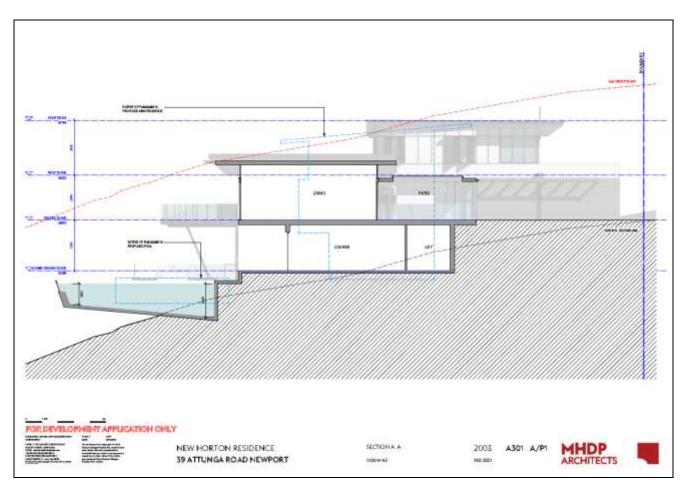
Illustrates the as proposed: Page 9 Site Plan/Site Analysis Plan, Page 10 Lower Floor Plan, Page 11 Elevations & above Section AA.
